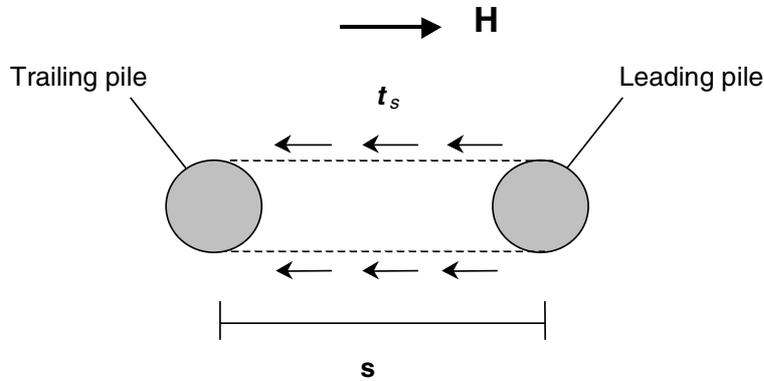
Plan view of block failure under lateral load (after Fleming et al., 1992).
